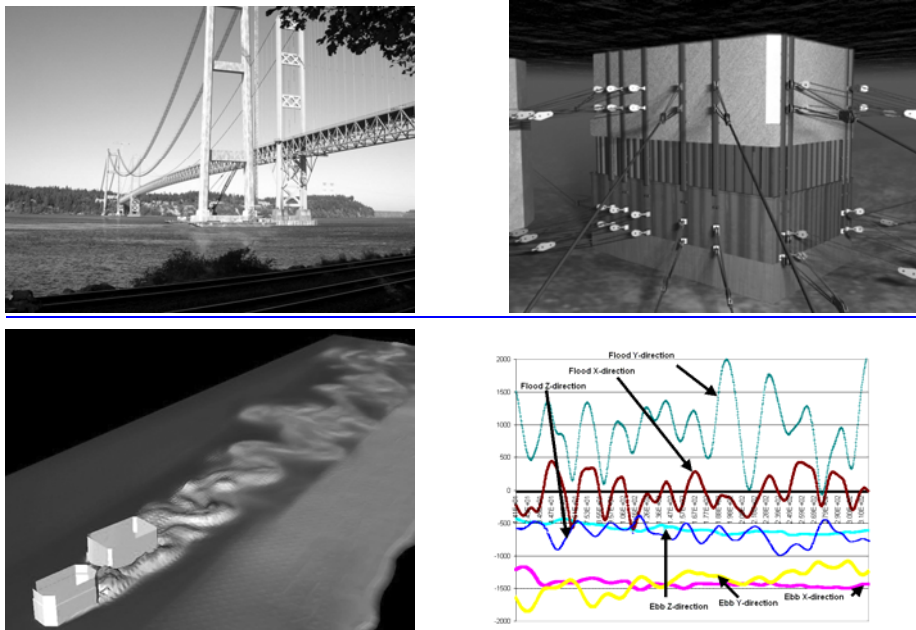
Rendering of new Tacoma Narrows bridge positioned next to existing bridge; caisson anchor system during installation; CFD analysis plot showing turbulence around two bridge piers subjected to current flow; plot of the time-varying load components subjected to the caisson during ebb and flood flows
